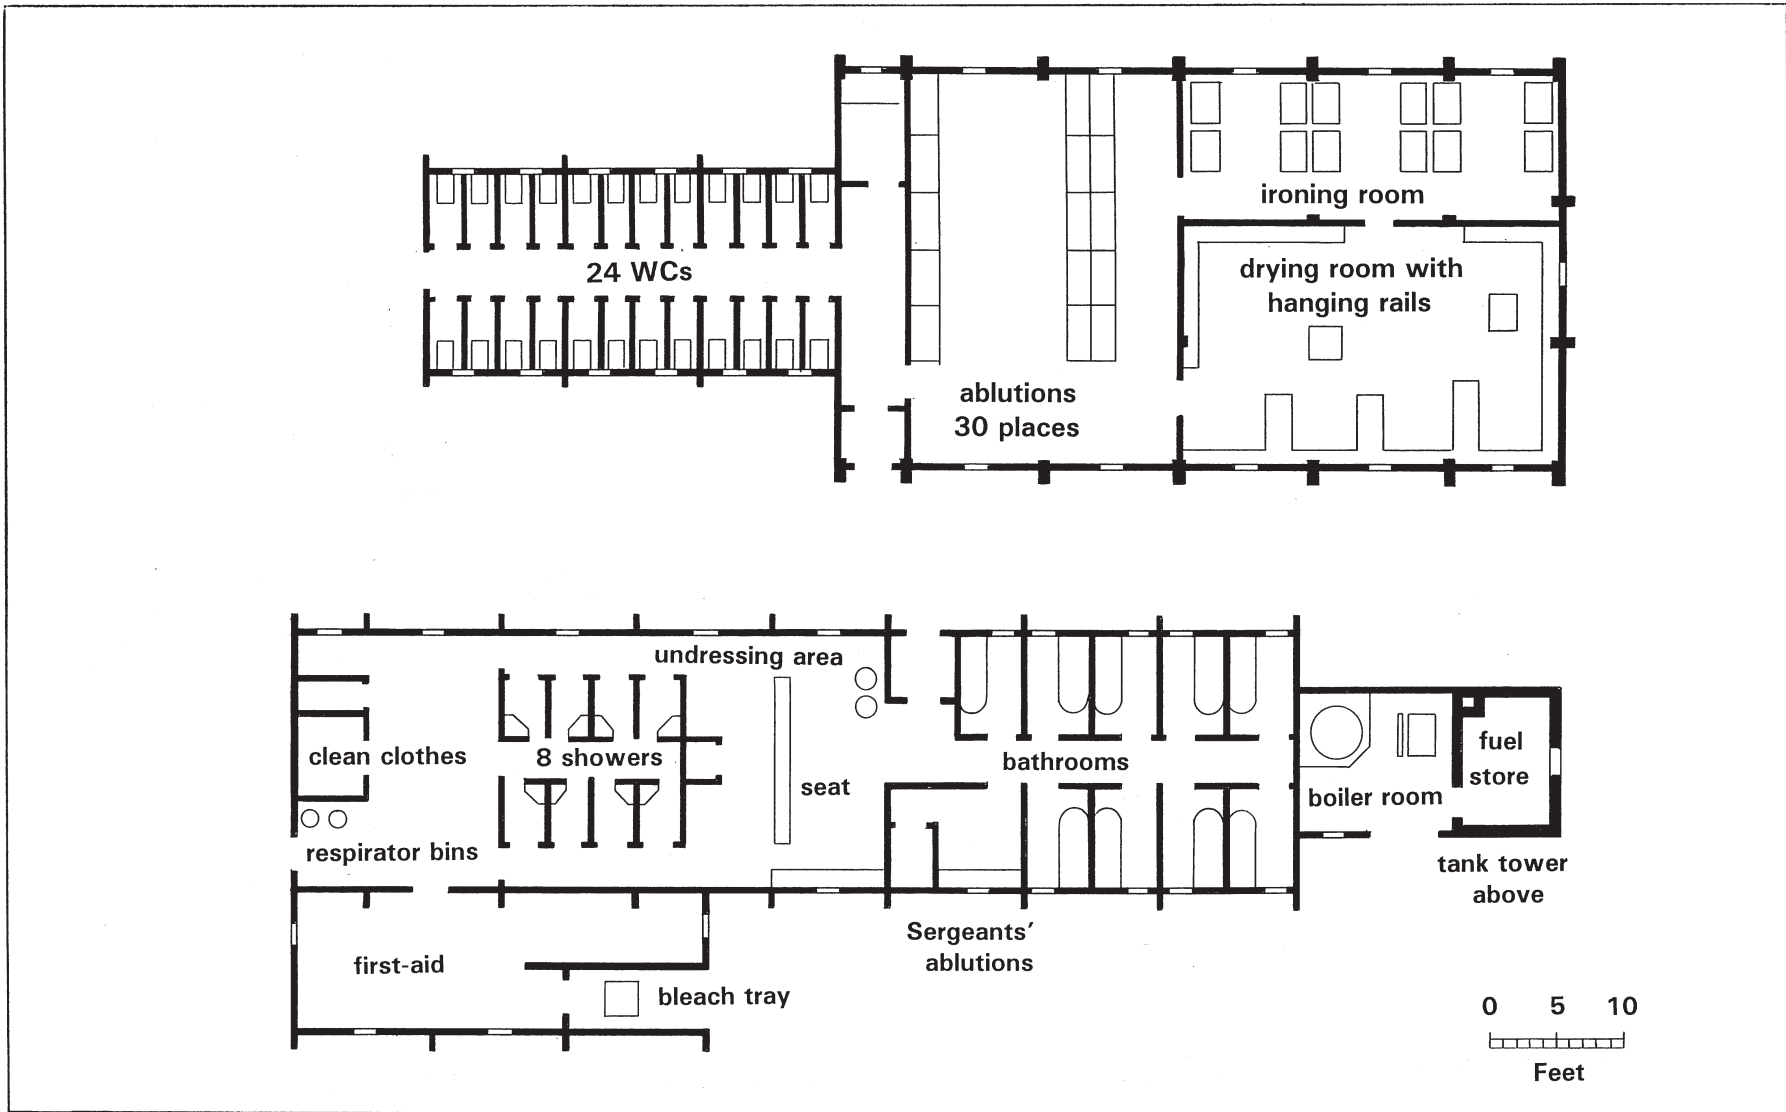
WAAF decontamination, bath, first aid and abluion blocks, type 8a. From drawing 16339/41.
